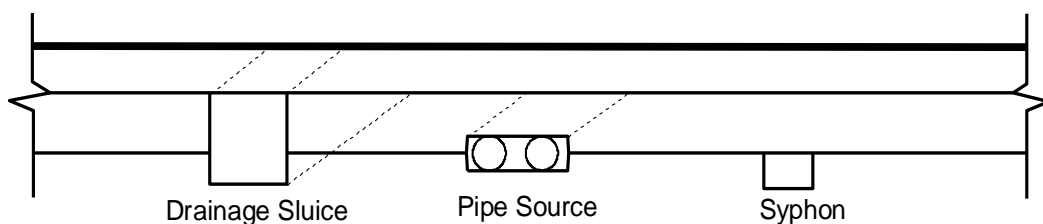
Schematic view of Drainage sluice, pipe sluice and siphon on embankment
